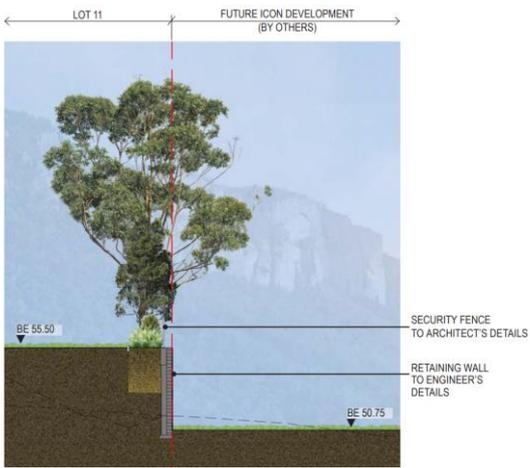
Western Boundary Retaining Wall – Landscape Sections
